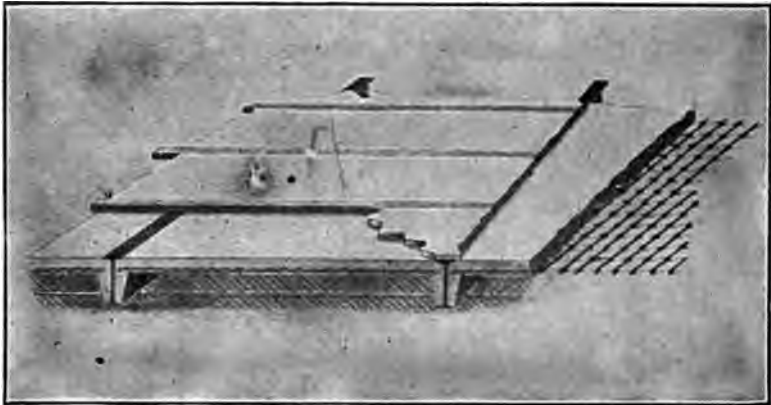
Floor Slab of Expanded Metal Carried on Lower Beam Flanges.
